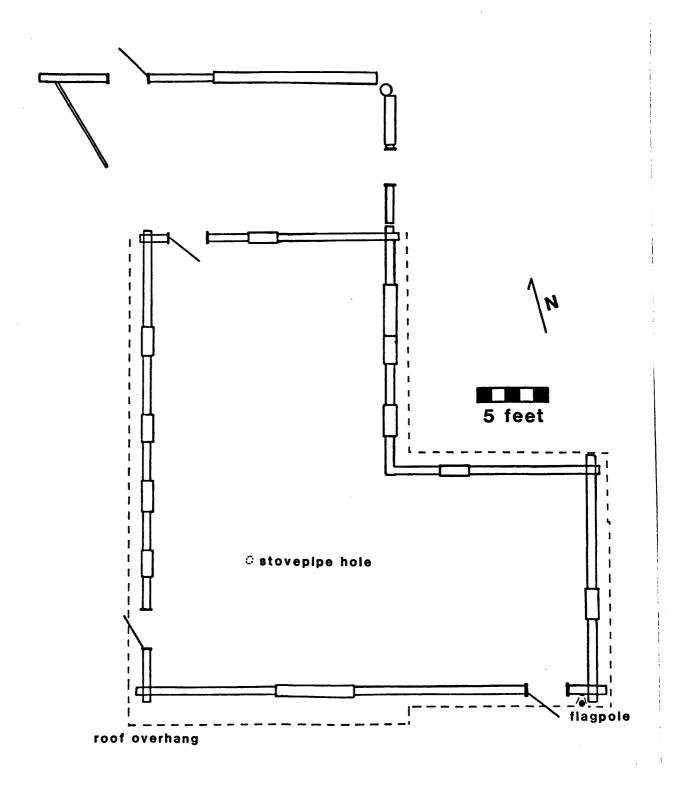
Example of the type of floor plans drawn for structures at the Leesburg townsite. This is a floor plan for Feature 10.
